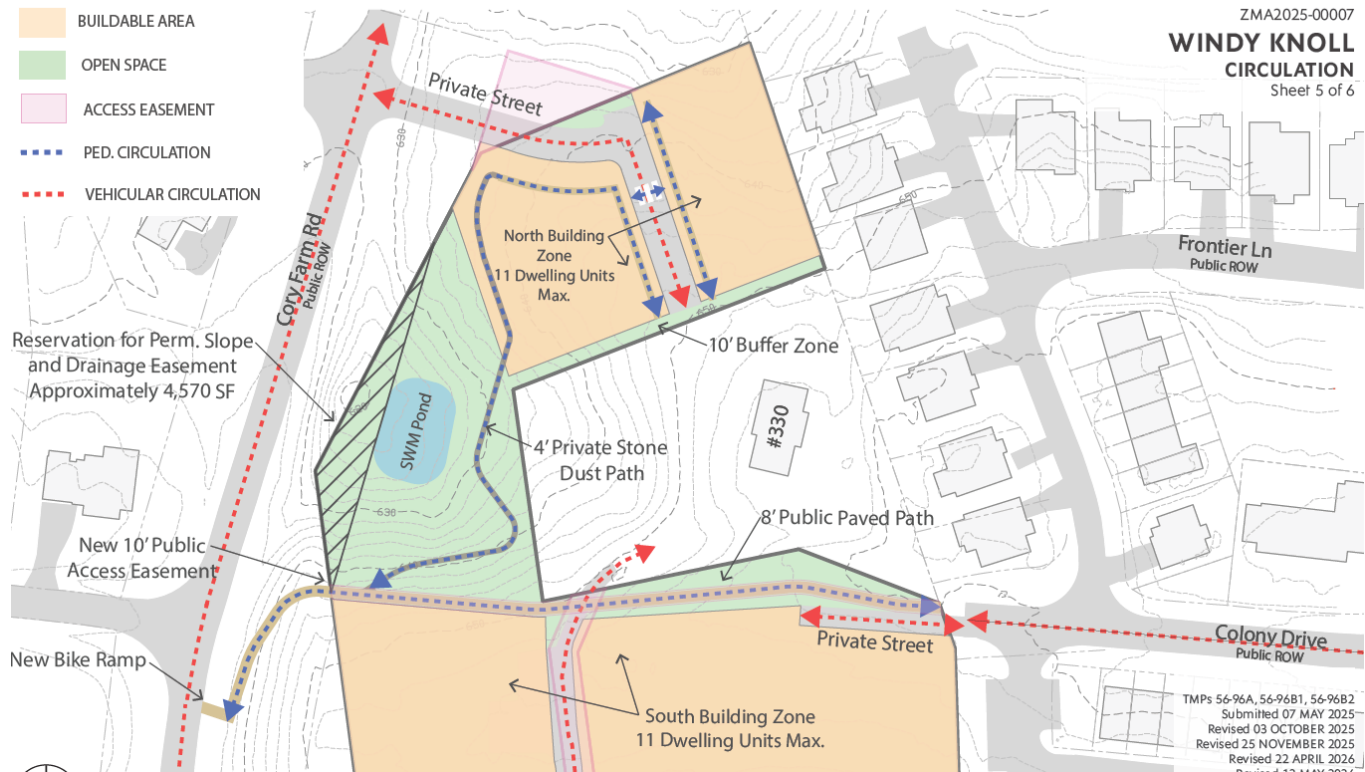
Sheet 5 of 6 Attachment 4: Conceptual Plan last revised May 13, 2026
